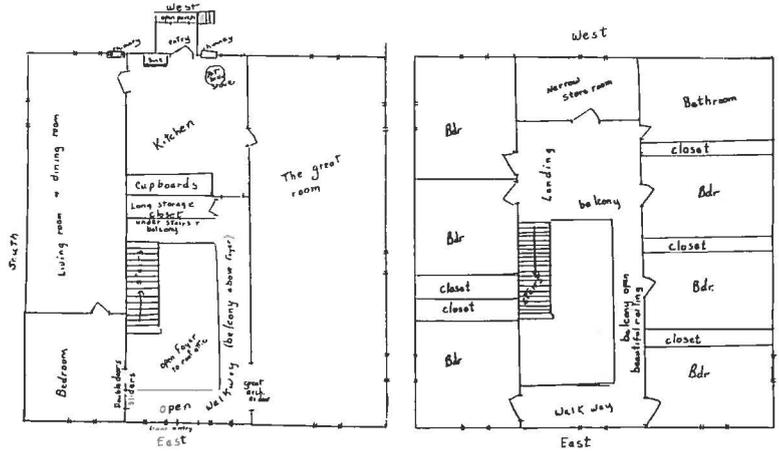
Laurits and Anna Petersen house. Floor plans, first and second floors.
